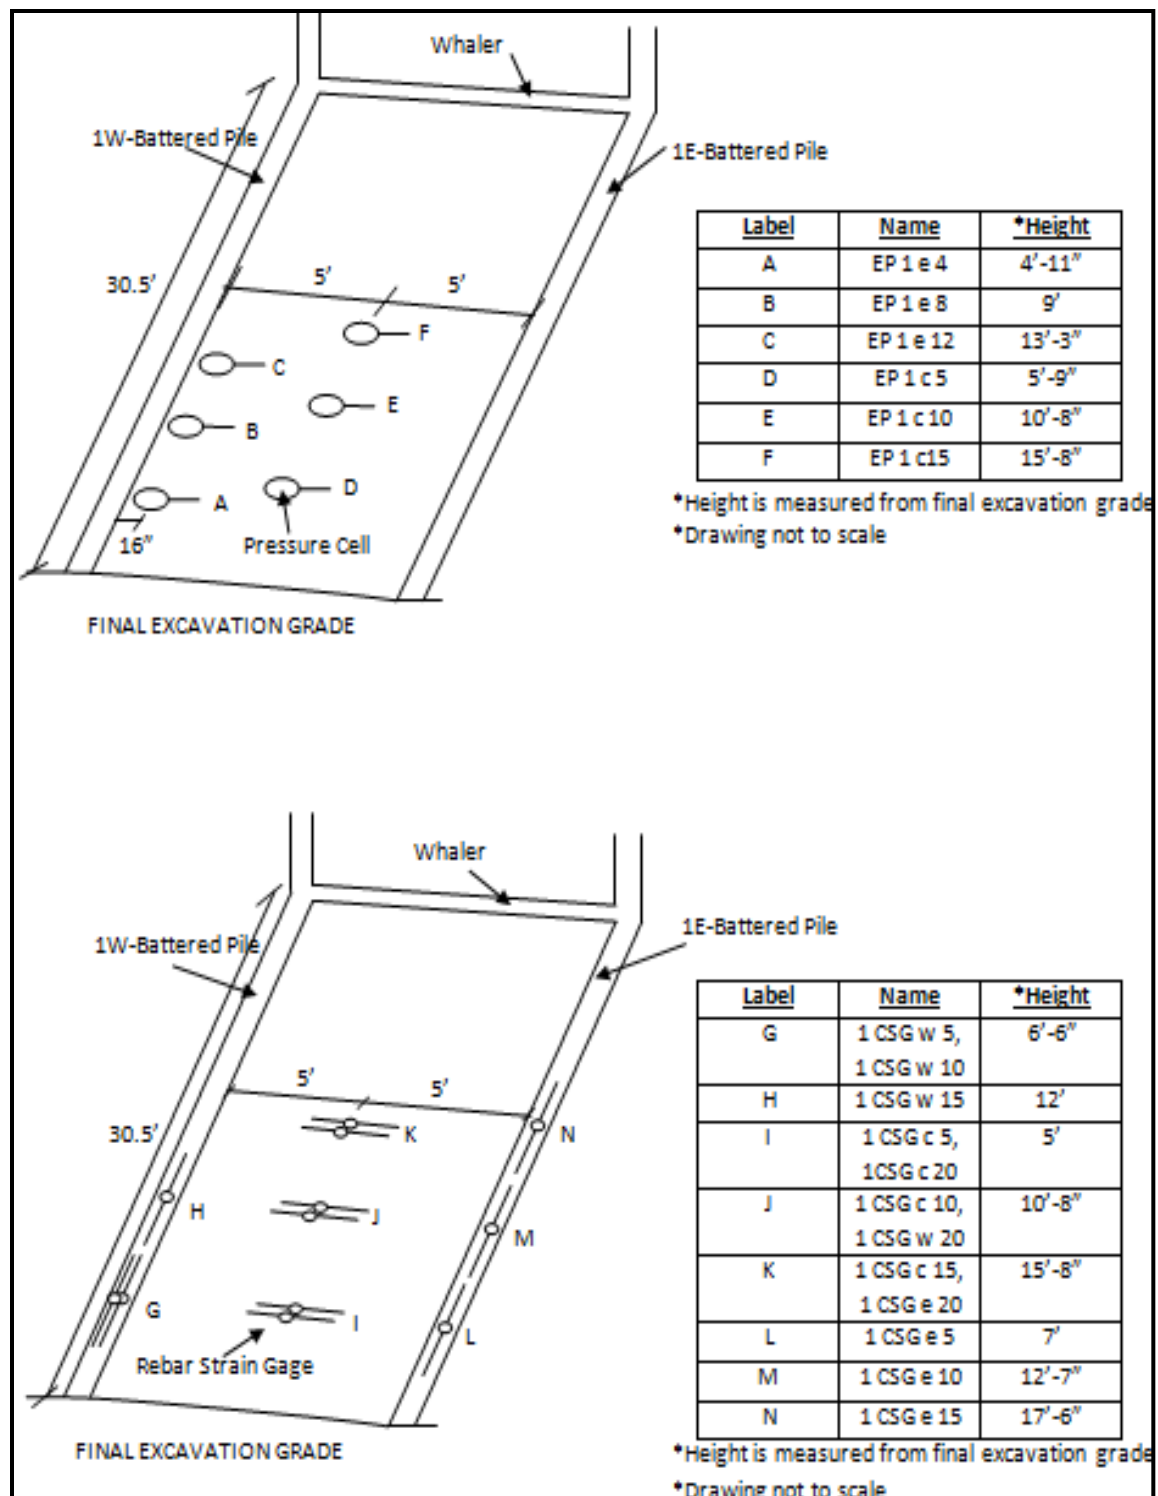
Section 1 Earth Pressure Cell and Rebar Strain Gage Layout
